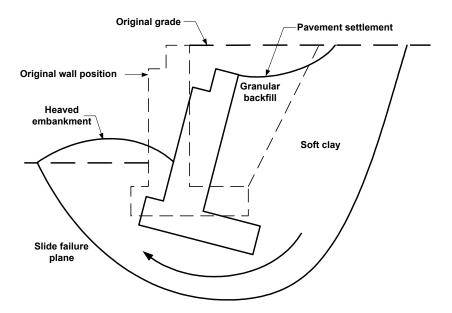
Lateral Movement of an Abutment due to Slope Failure
